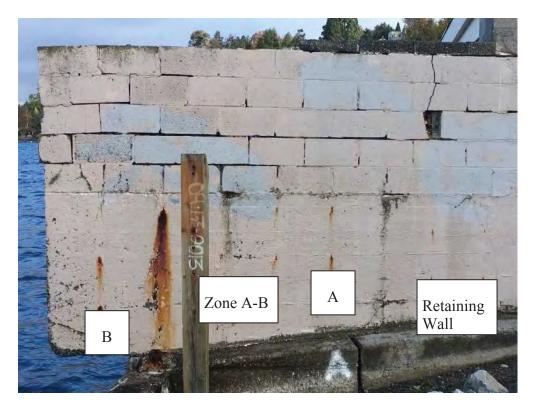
Zone A-B, Adjacent Property. *Source: Reid Middleton Site Visit 10/18/2016
